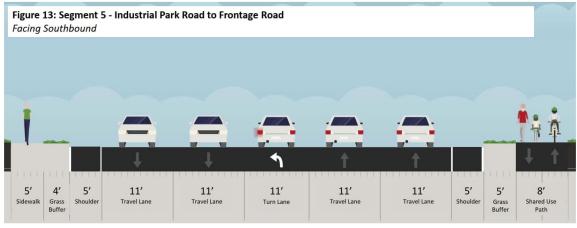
and 14 show the improvements developed for the Route 161 corridor segment between Industrial Park Road and Frontage Road. The improvements include:
